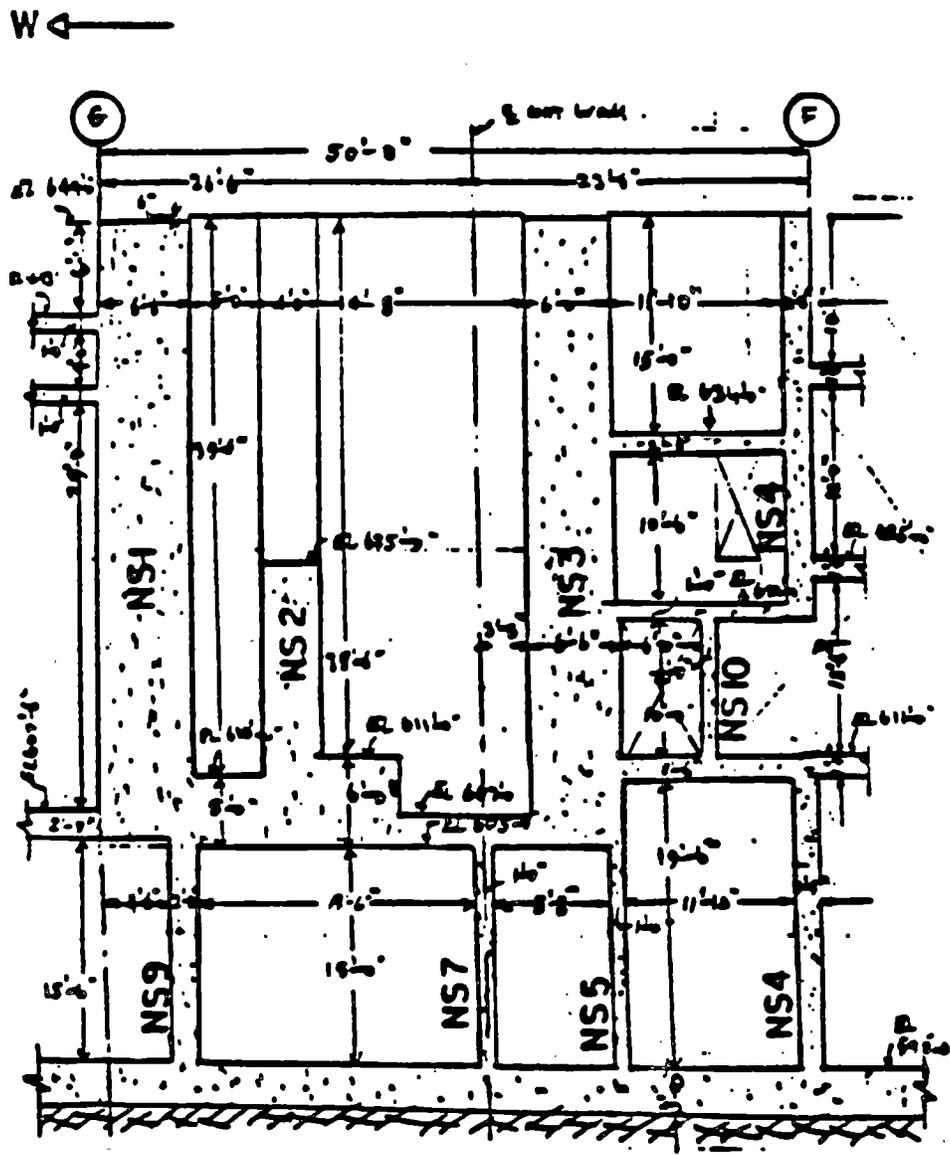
Section H-H - Elevation 590 ft to 649 ft
